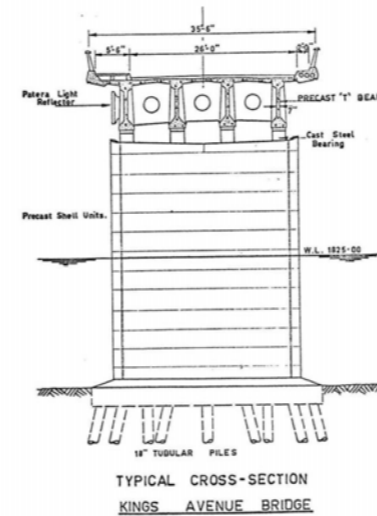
Kings Avenue Bridge design with broad precast sectional piers and prestressed 'T' beam superstructure.
